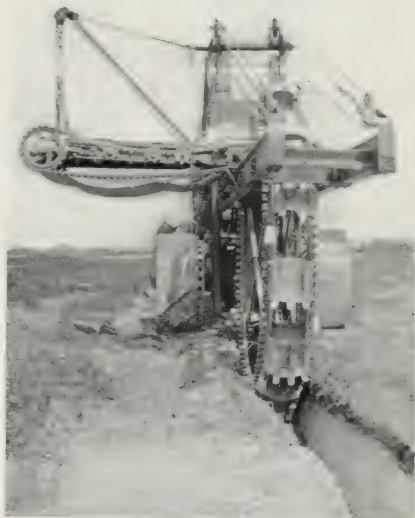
REAR VIEW OF DITCHING MACHINE AT WORK
